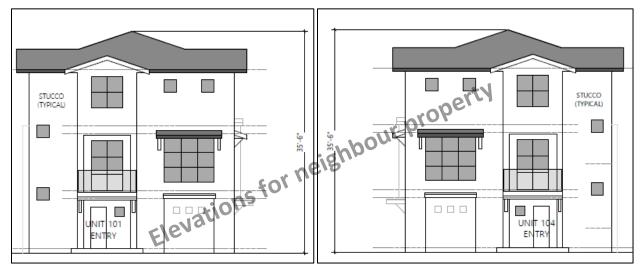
Conceptual South Elevation (481 Wade Ave E)
